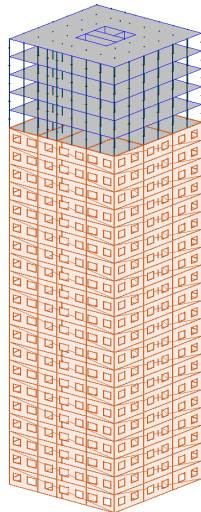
FE model of the 25 storey mixed building. The bottom 20 storeys are designed with a CLT system. The 5 top storeys are designed with a column system.
